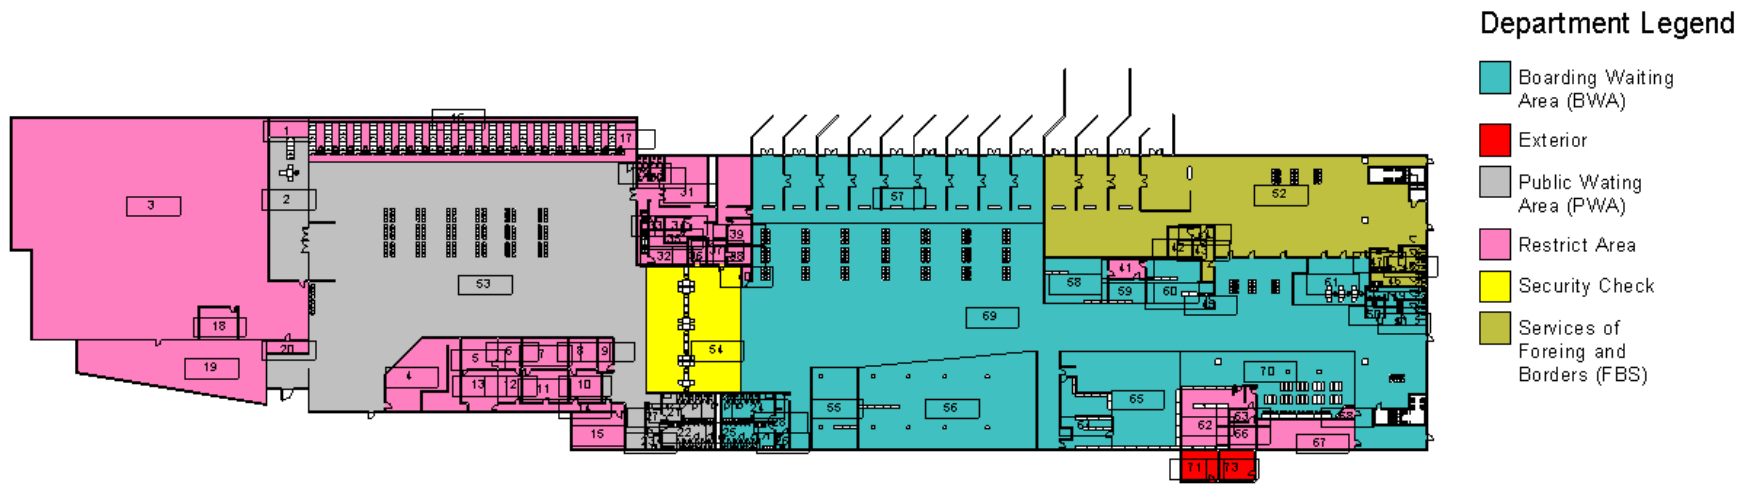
Terminal A Ground Floor Plan (Divided by Room Type)
